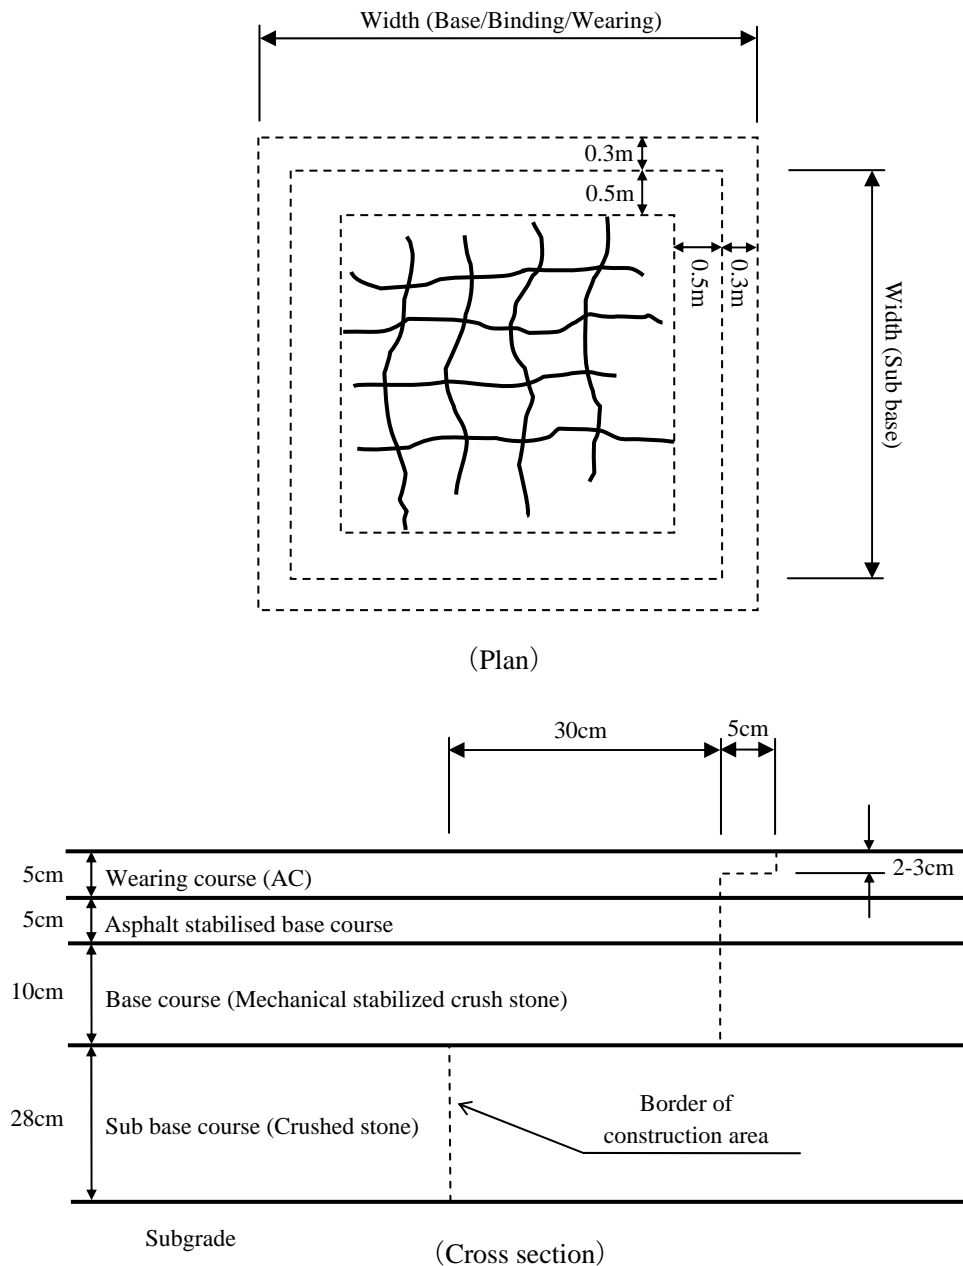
Model of Partial Reconstruction of Pavement Structure
